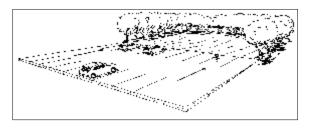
Parking area draining to landscaped area (Waterfall, undated)
